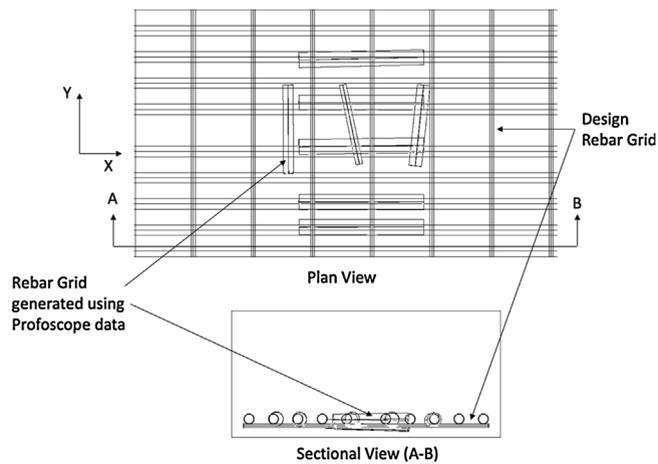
Rebar Grid generated using Profoscope data (RC Bridge Deck Slab at Site SI-3006A).
